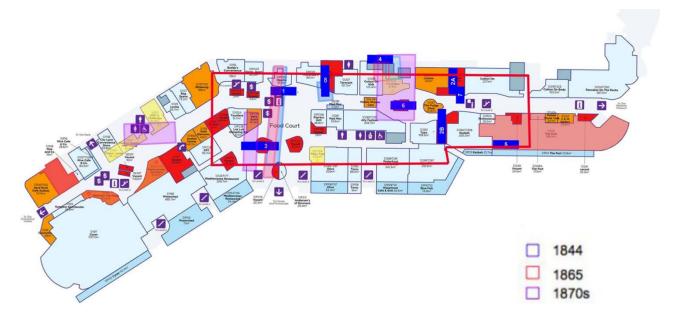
Location of proposed basement (red outline). Top of image is west and the numbered rectangles are test trench location proposed by Curio Projects.⁵⁹
